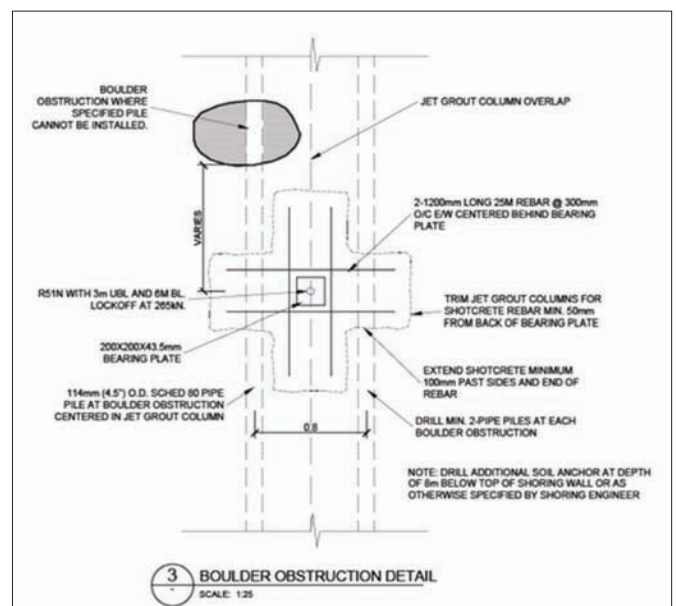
Boulder obstruction detail in case it was not possible to install the designed H-Beam.
